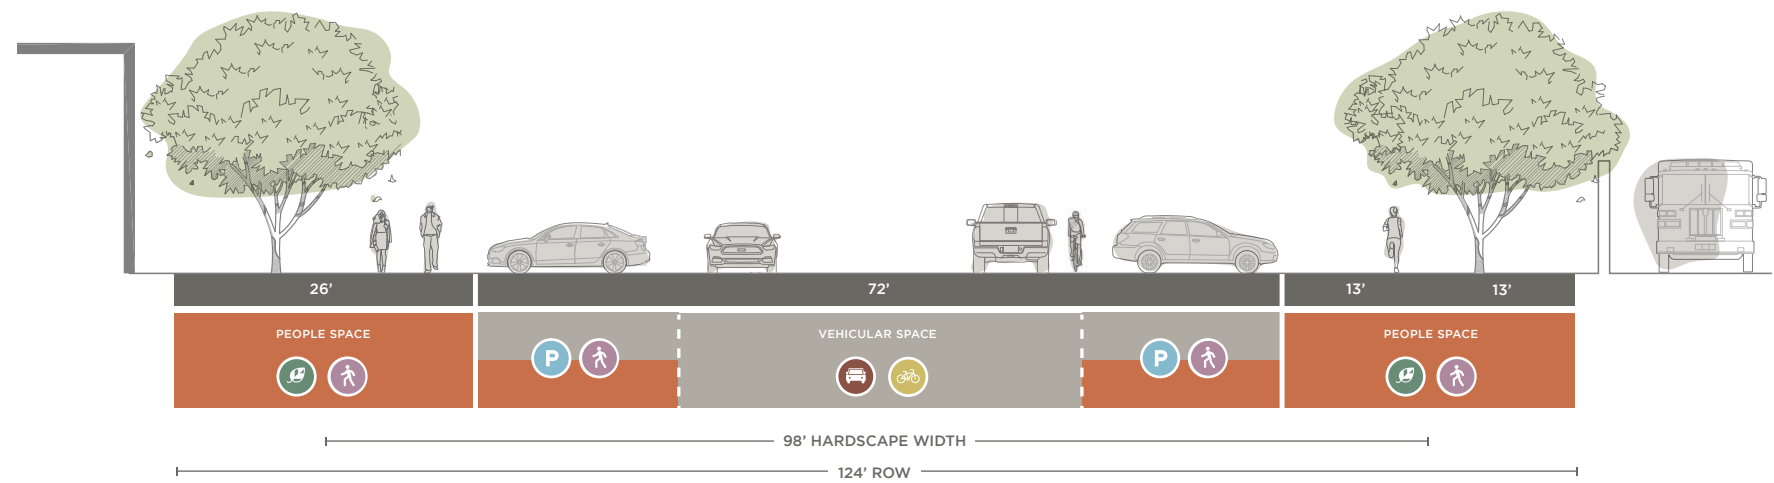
Japantown Street Concept Option B and Roadway Section
